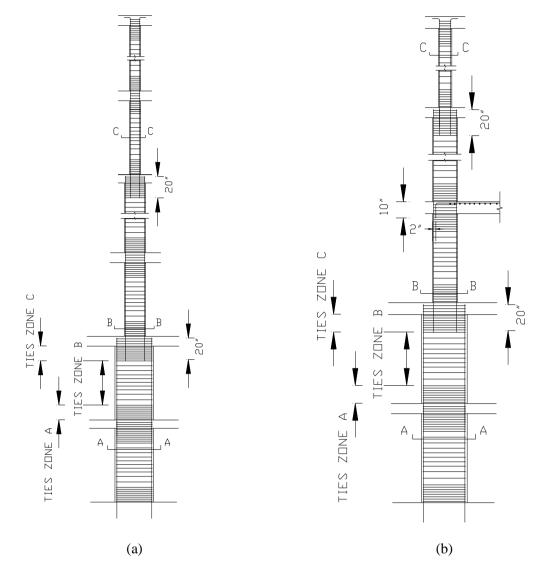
(a) Reinforcement details of central column, (b) Reinforcement details of column with stair connection
